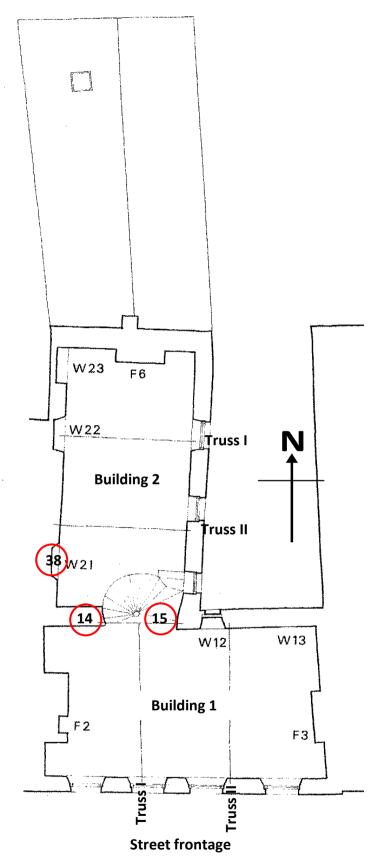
Plan of the Ship Inn at second floor level to show arrangement of the buildings and the locations of the sampled timbers (see Table 1) (after Phillip Cracknell/Alpha Design)
